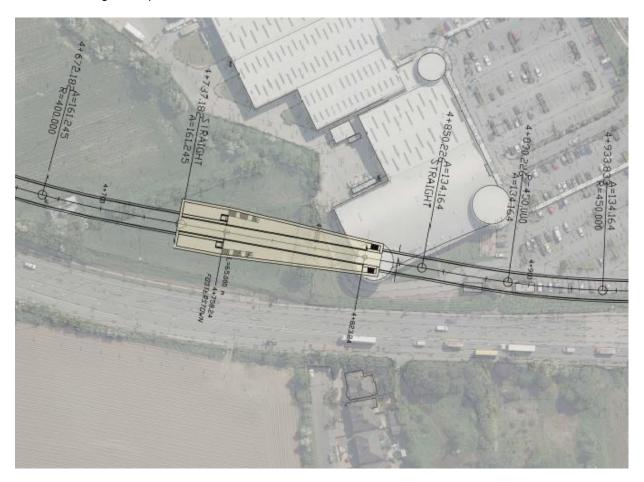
Airside Buildings and Preliminary Design Station Alignment
